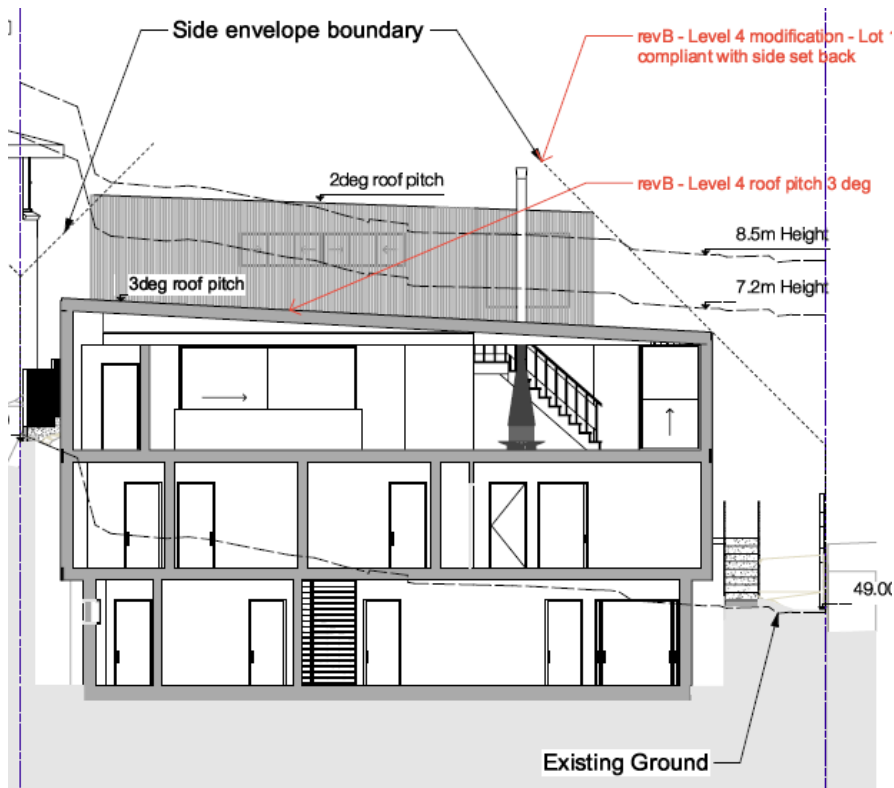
excerpt of plan section P-02 drawing 2 showing 1 of 5 sections depicting the side boundary envelope plane for the proposed dwelling house on approved Lot 1
